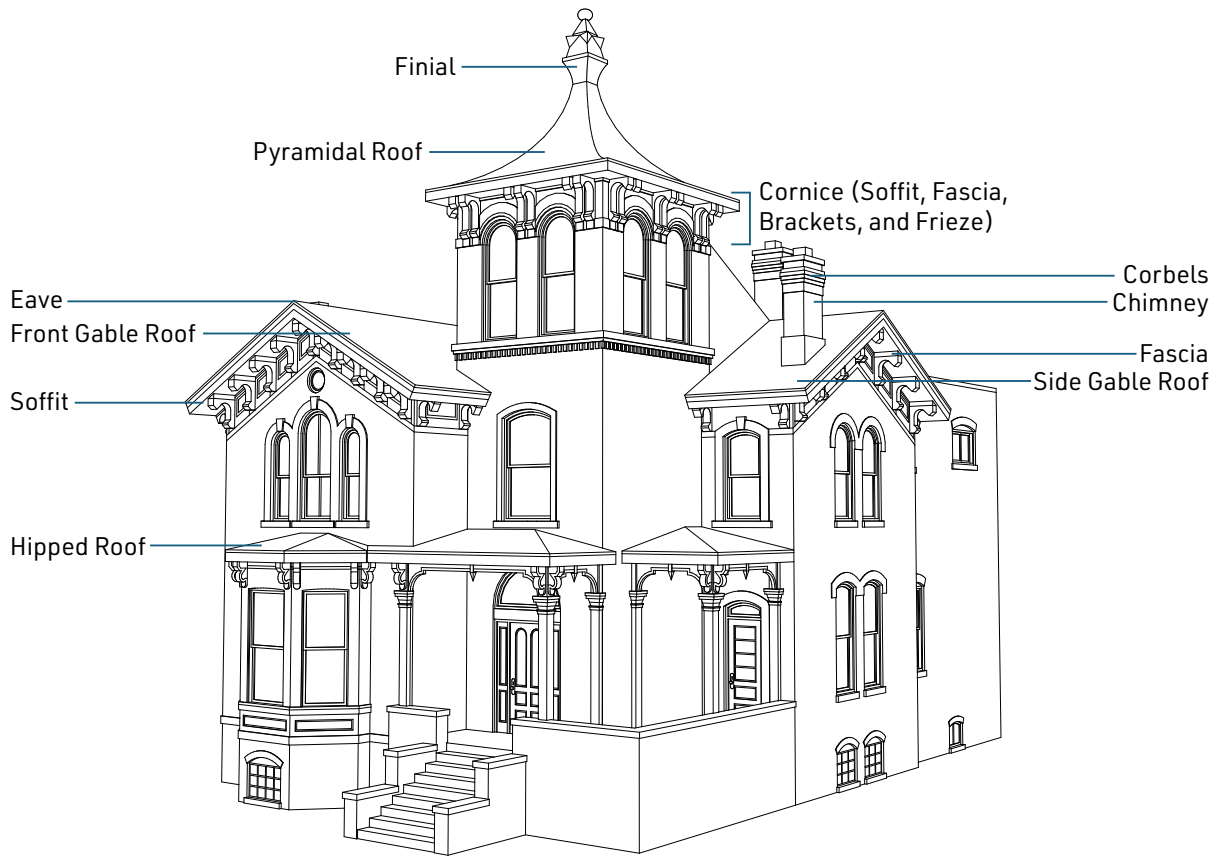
An Italianate-style house, showing roofs, chimneys, and architectural features.
